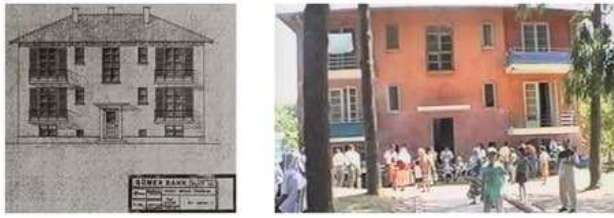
Façade drawing and a photograph of the apartment blocks for workers with families (source: archive of İlhan Öden, 2023)
